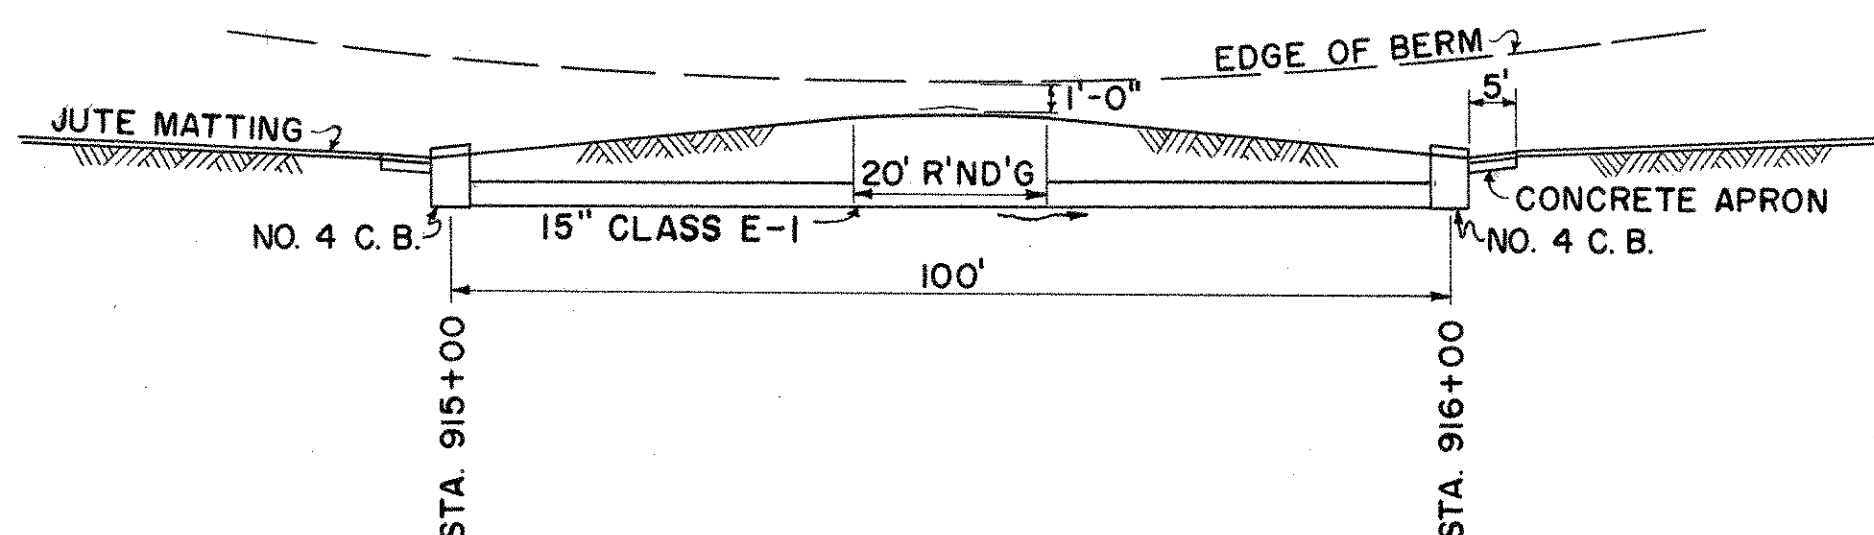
DETAIL OF SODDING FOR SPECIAL BERM AND SLOPE PROTECTION No Scale
